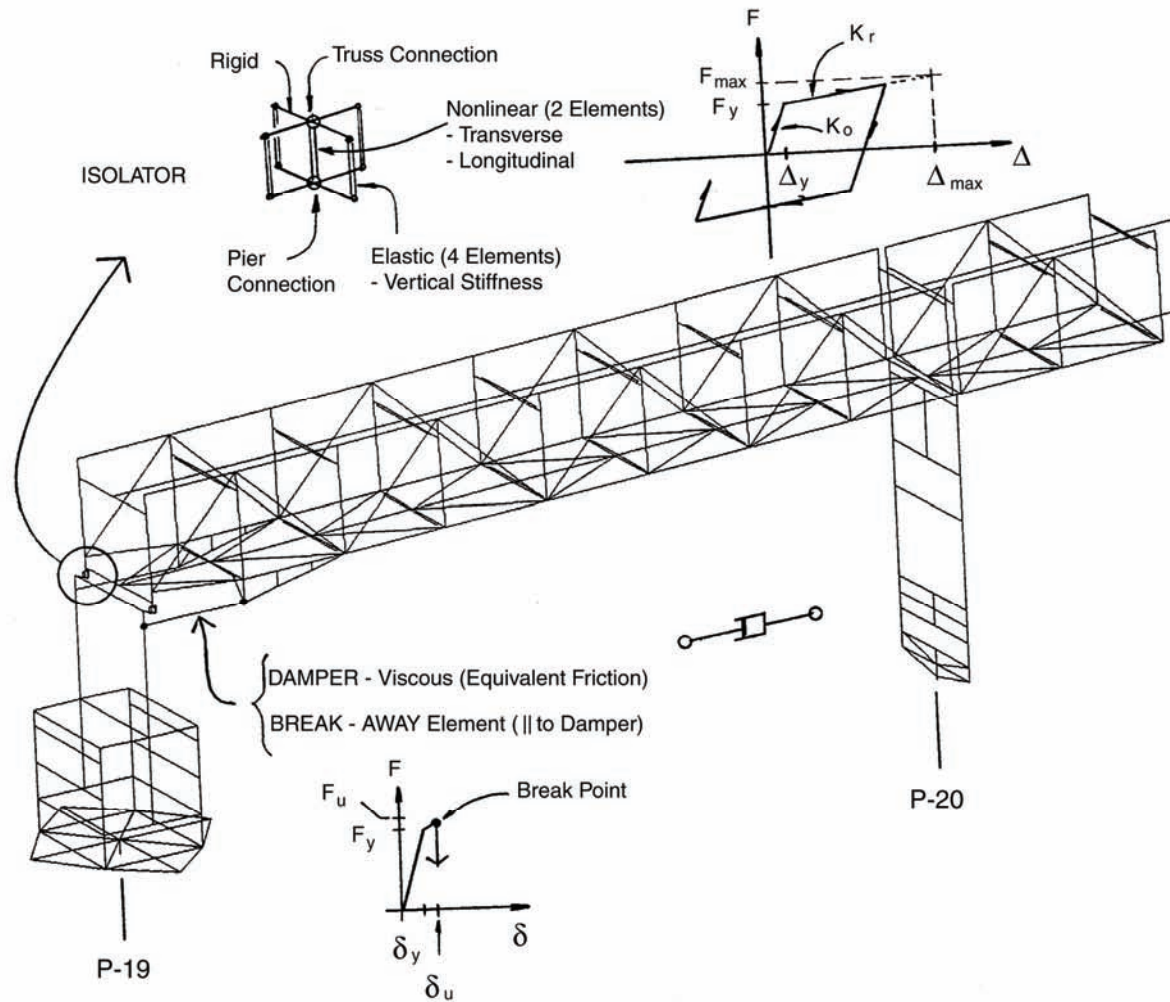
Typical Simple Truss Span Model With RMD Retrofit
